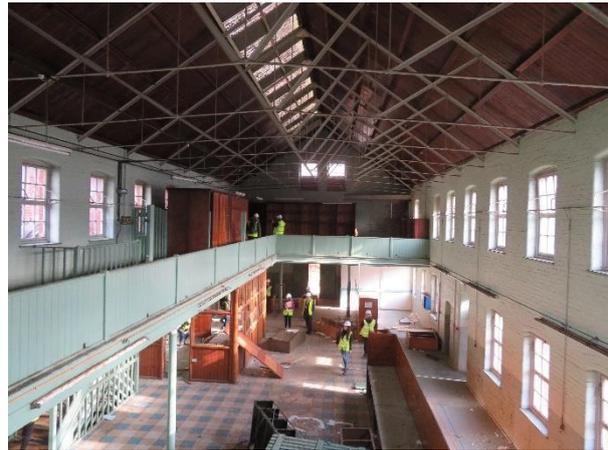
& 18, Wrought Iron roof construction, source: Author's own 2020
